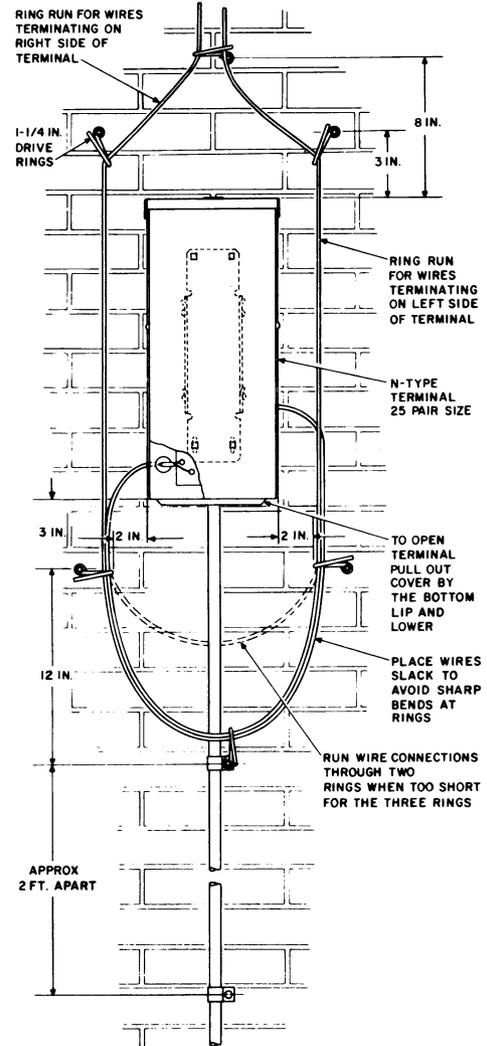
Wall-Mounted 25-Pair Cable Terminal With Stub at Bottom
